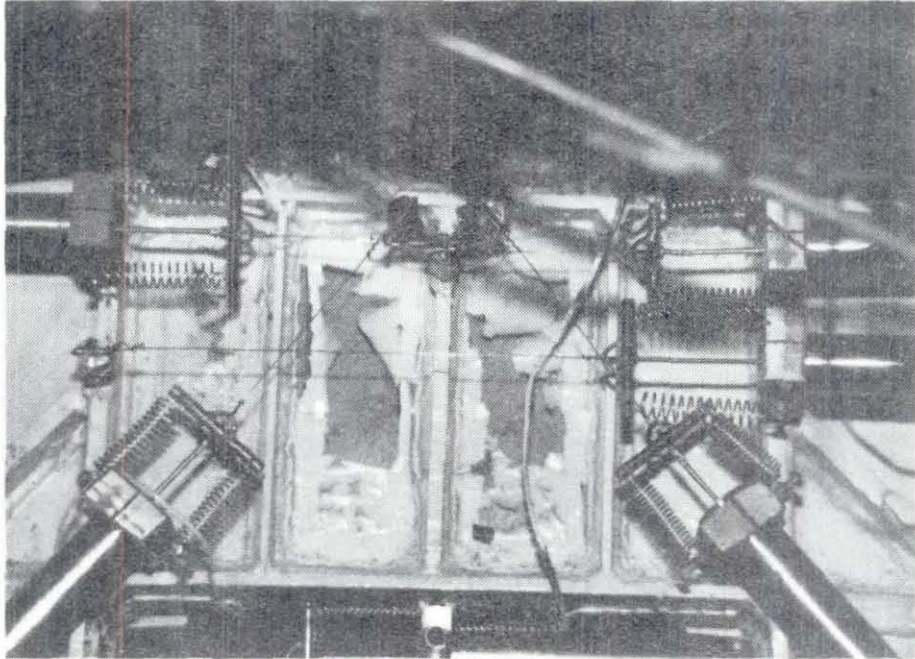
L2 SHEAR LINK - POST TAFT-57 TEST
